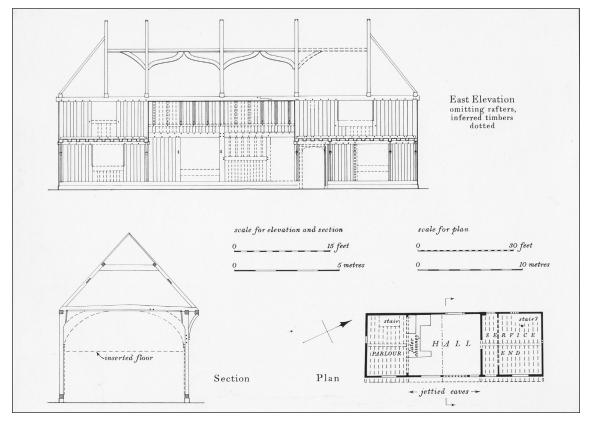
Burgh Hall, Swaffham Bulbeck, showing the 15th century roof structure (HEA BF014326).
